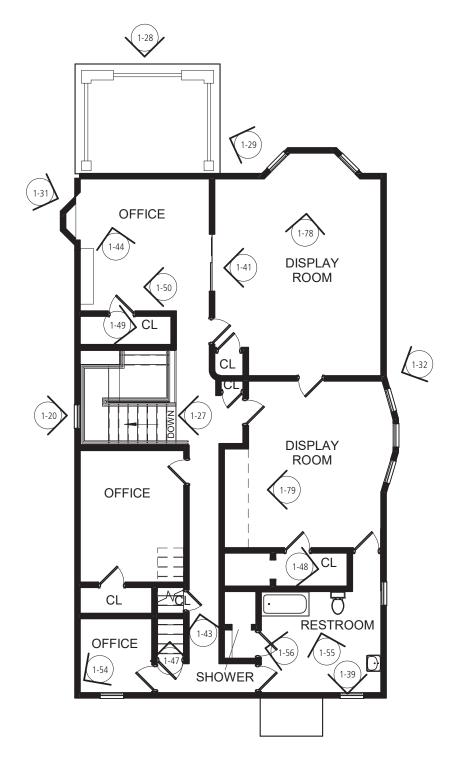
First Floor Plan, 2020 (source: Ratio)
